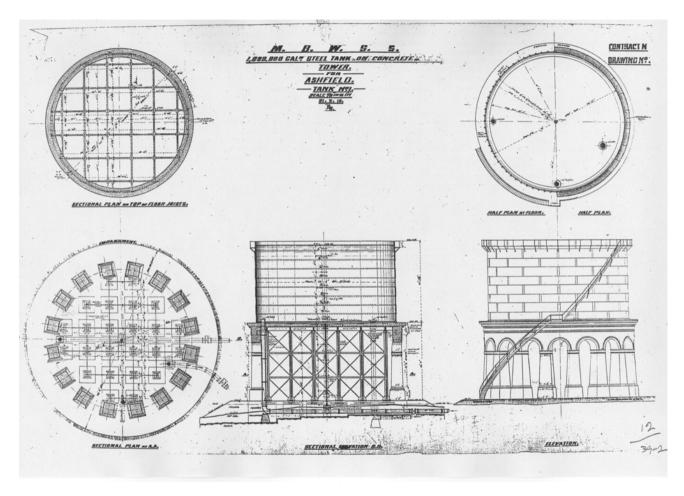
Archival Plan, Steel Tank on Concrete Tower for Ashfield, 1910
